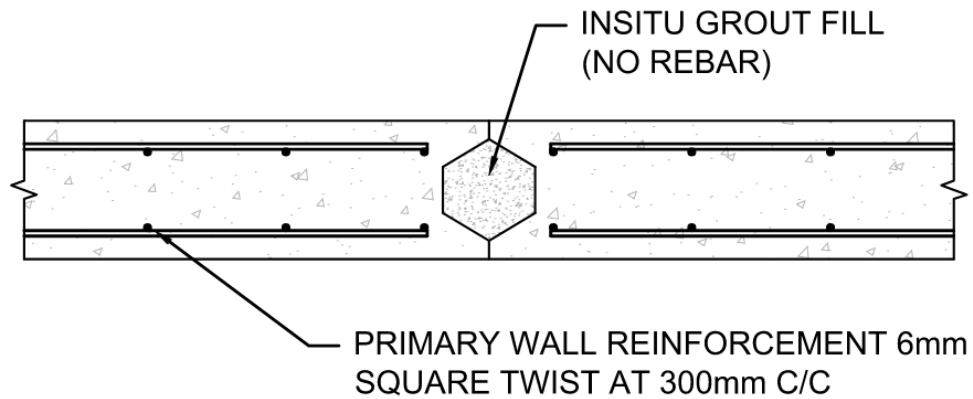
Joint detail between cross wall panels as identified on site and in record drawings.
